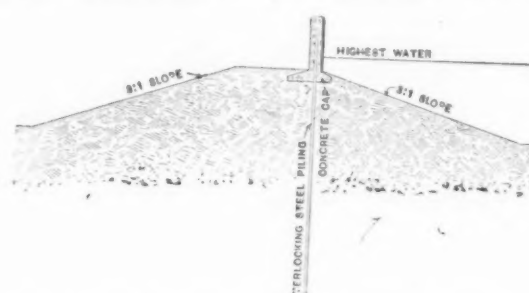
FORT ST. PHILIP SEAWALL CONSTRUCTION.
